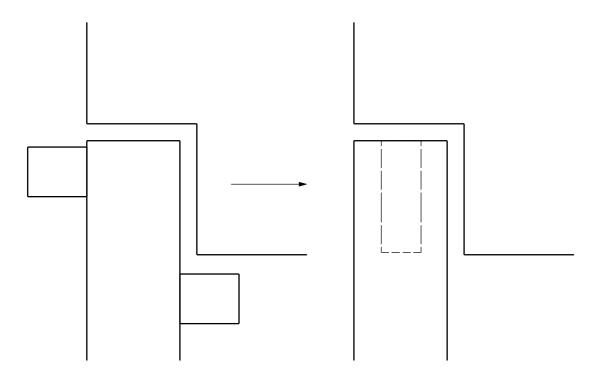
Door closer - Change of location (face mounted for concealed)
